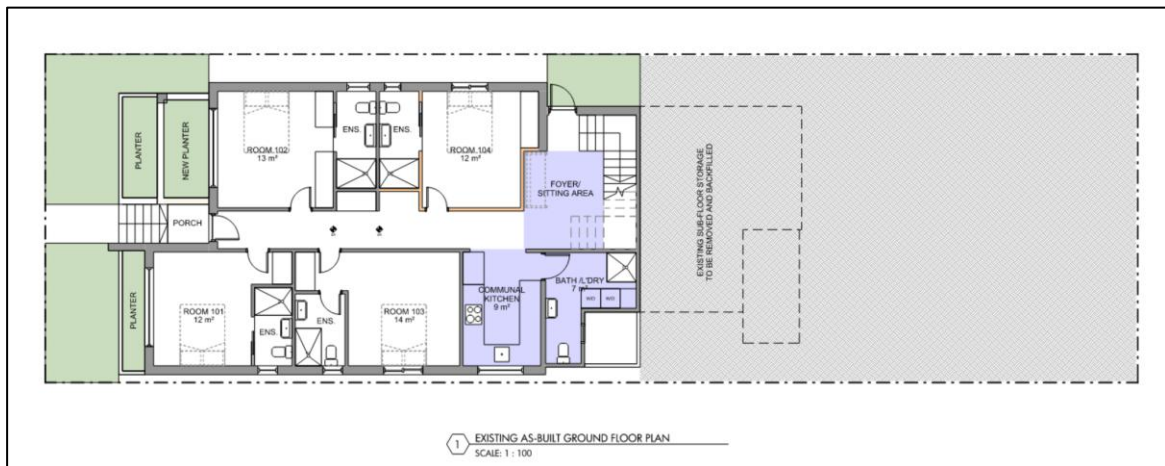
Proposed and as-built ground floor plan (Source: Applicant)
